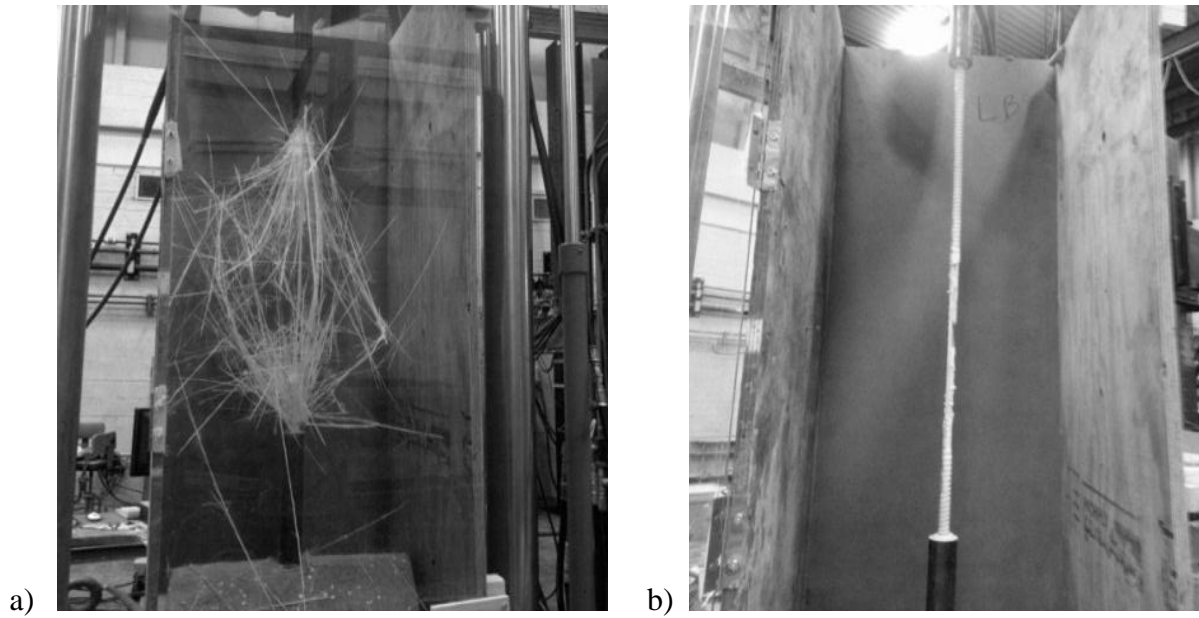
Specimen failure a) SB bar, b) BB bar
